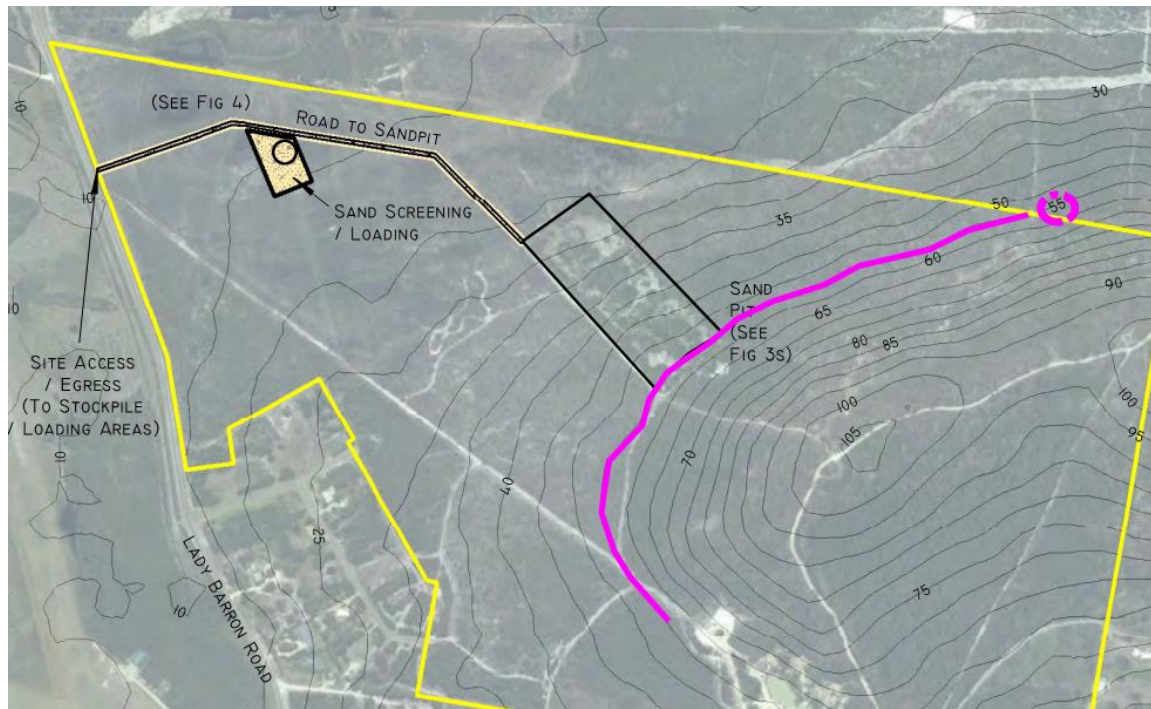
Site elevation from development application supporting information Figure 2 (page 14).
